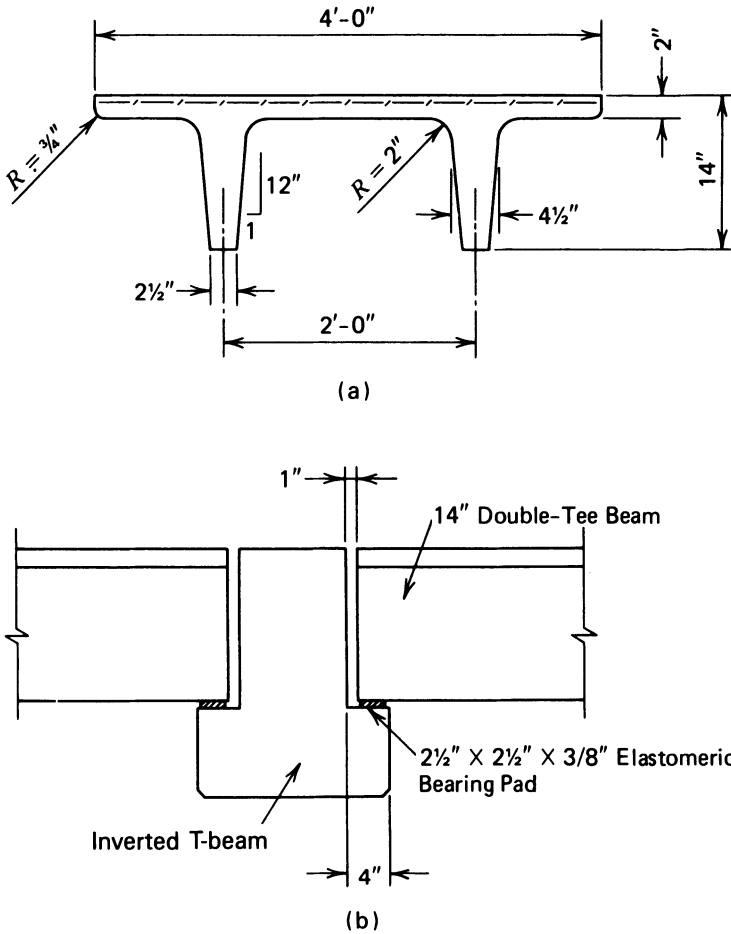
Double-tee beam and inverted-tee beam used in I.P. 6-7. (a) Cross section dimensions of double-tee beam. (b) Cross section of inverted-tee beam.
